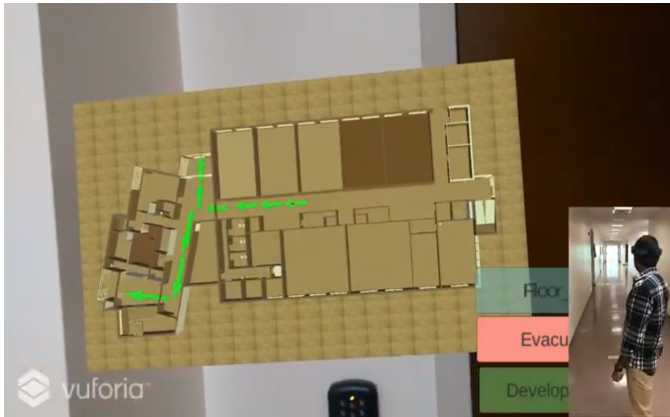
View of the floor plan from HoloLens using existing 2D plan as a marker
